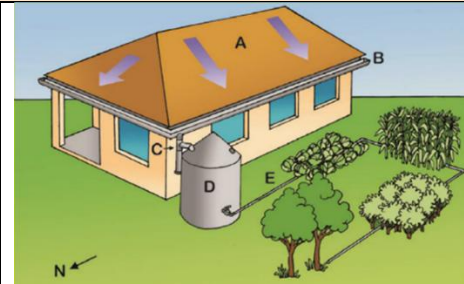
Schematic illustration of a typical roof rainwater harvesting system showing roof catchment (A), gutters (B), downpipe (C), storage tank (D), and distribution to crops (E).
